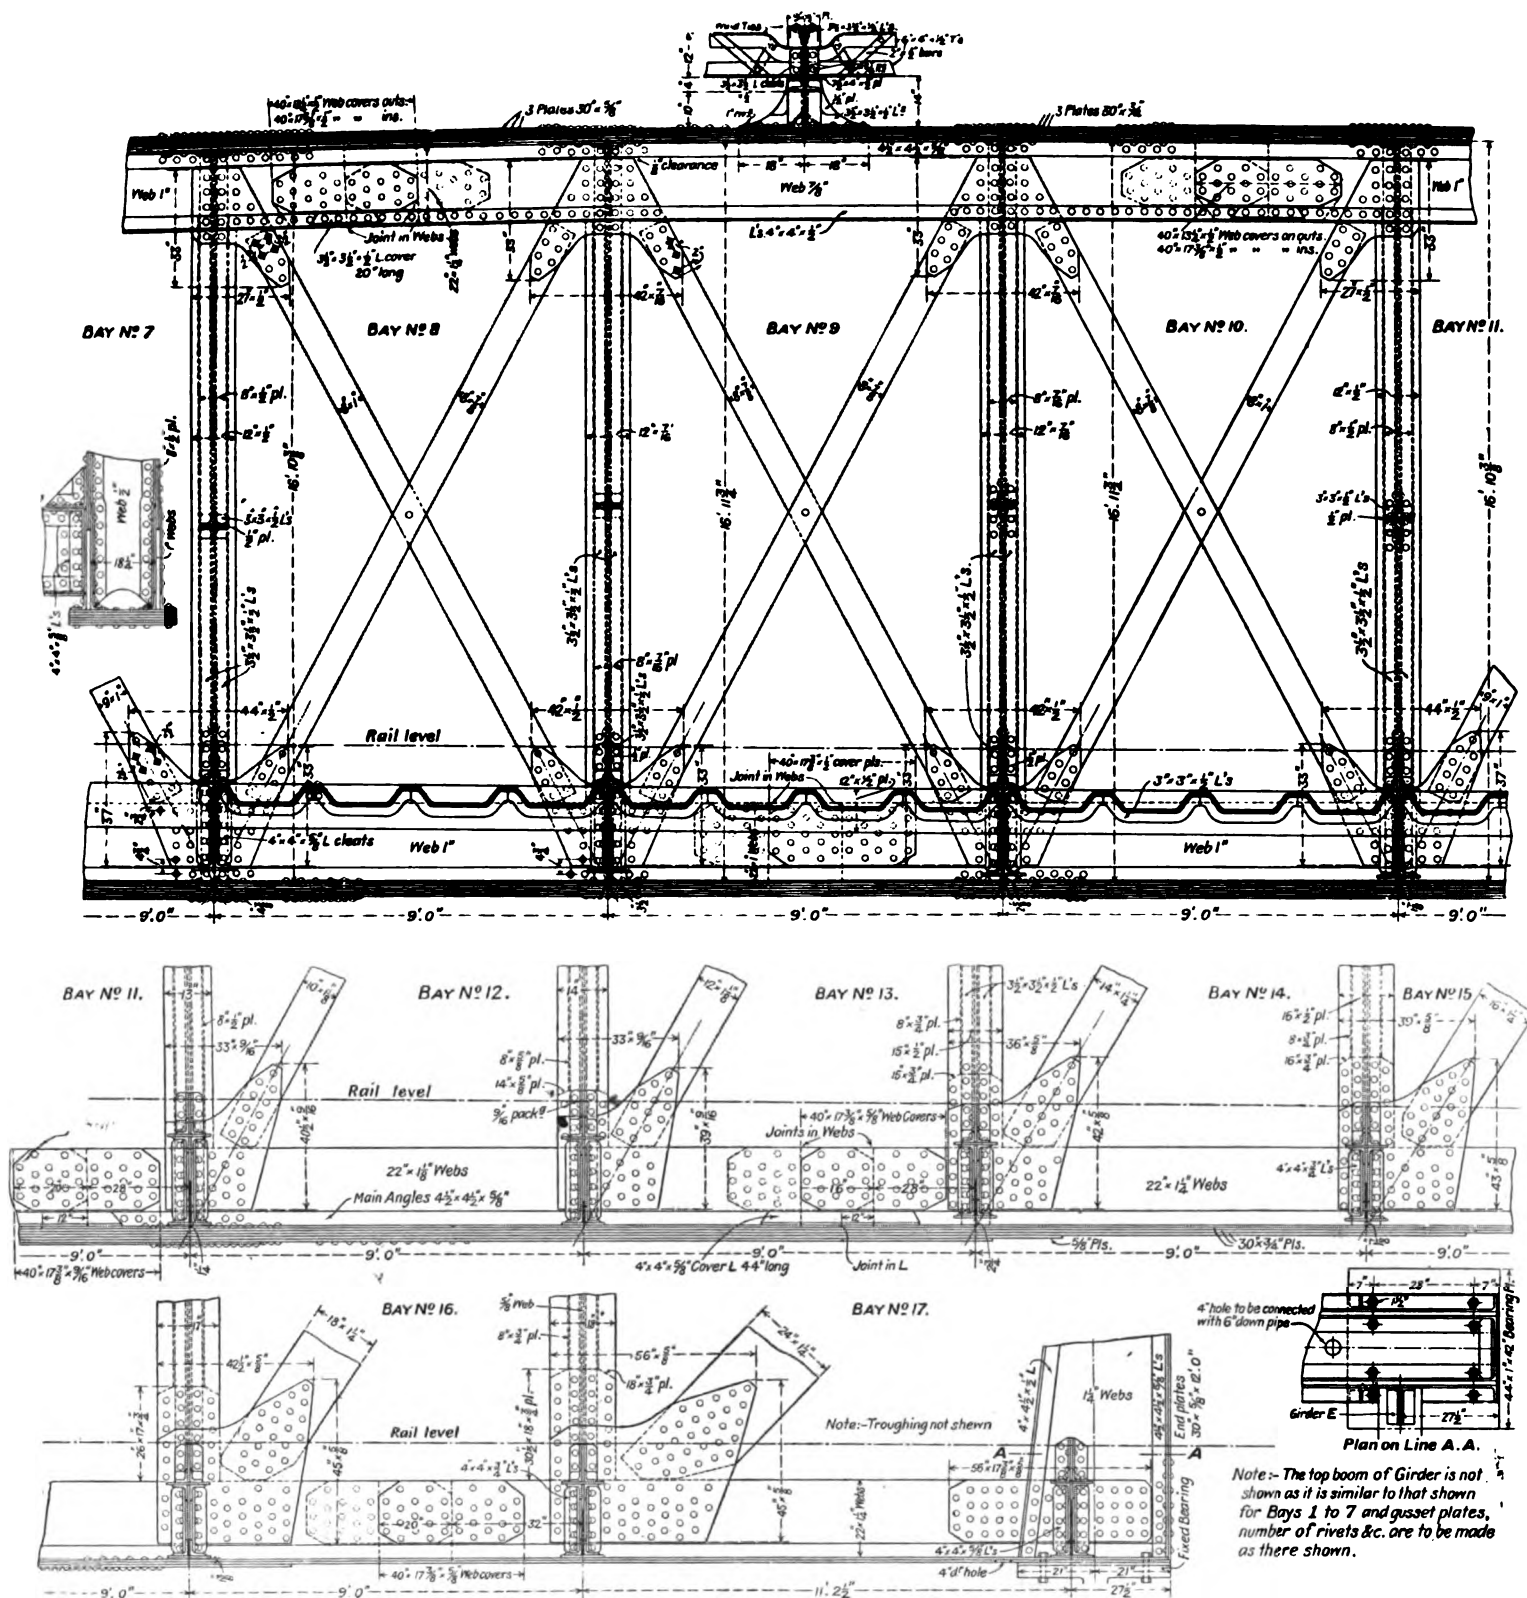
Bridge over North London Railway. Details of North Girder, Bow to East Ham Widening; L.T. & S.R.
